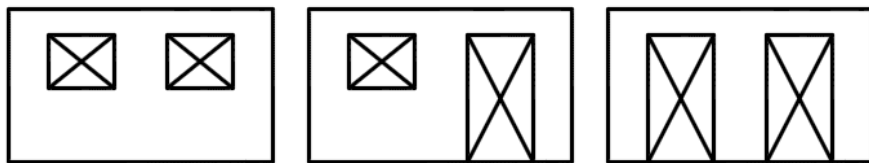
Typical openings in masonry infill walls in southern European countries
